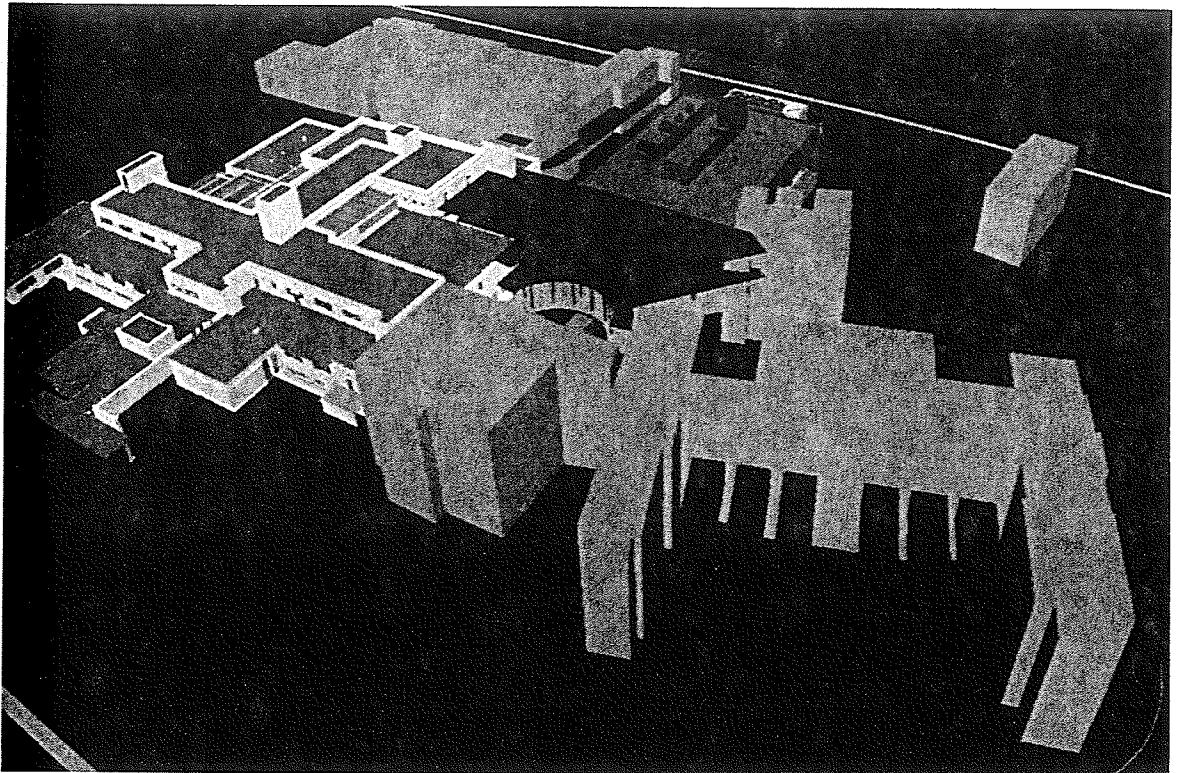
March 1995 As work on the new Central Utilities Plant proceeds as the critical activity, construction on the first half of the North Addition begins. Trailers are installed by Clinics building.
